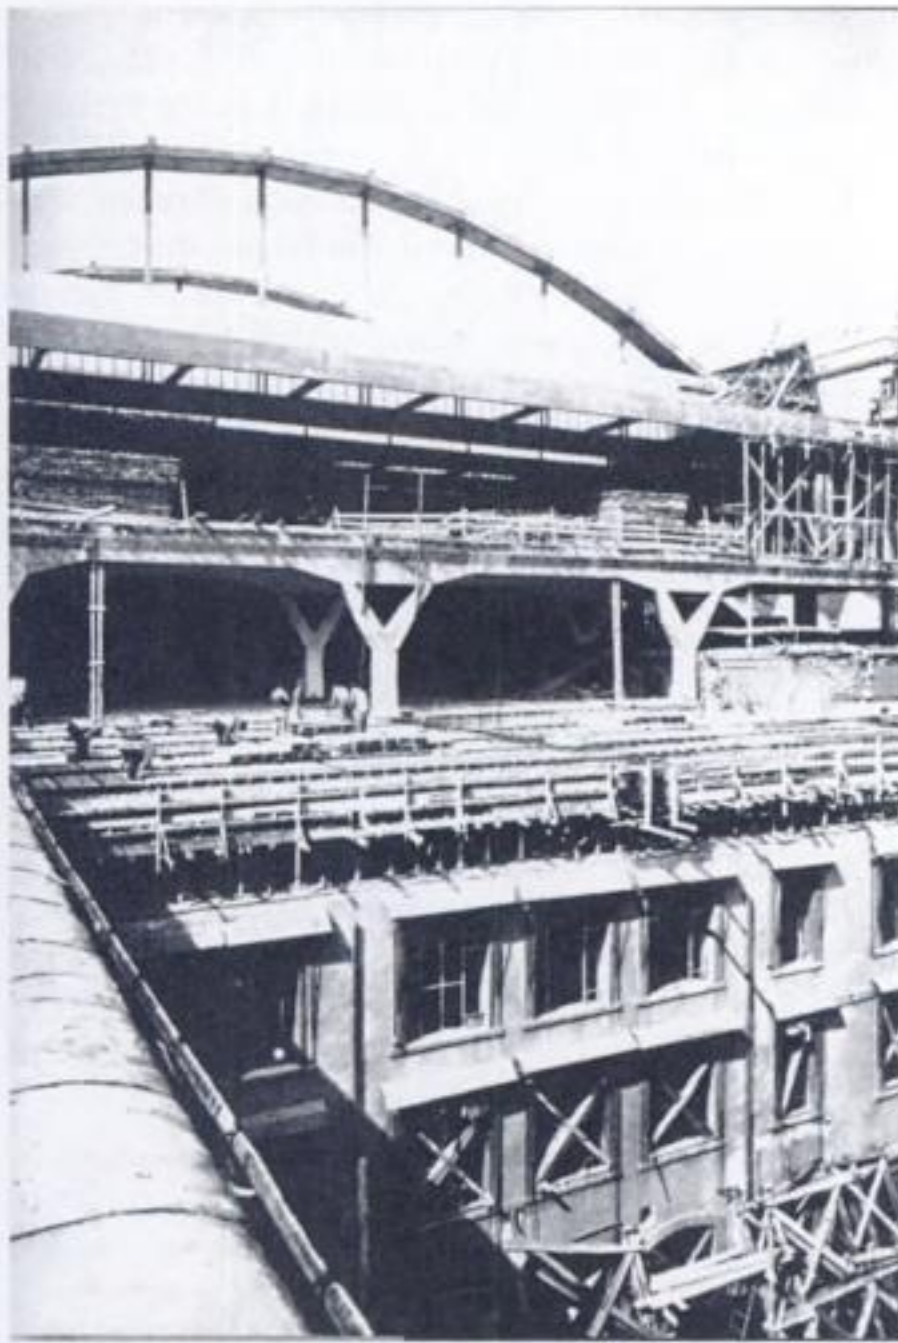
Another view of the building site of the Marzotto factory designed by professor engineer Bruno Dall’Aglia.
